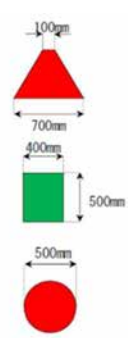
14 : Arrangement of Light-Beacon at the Construction Area
